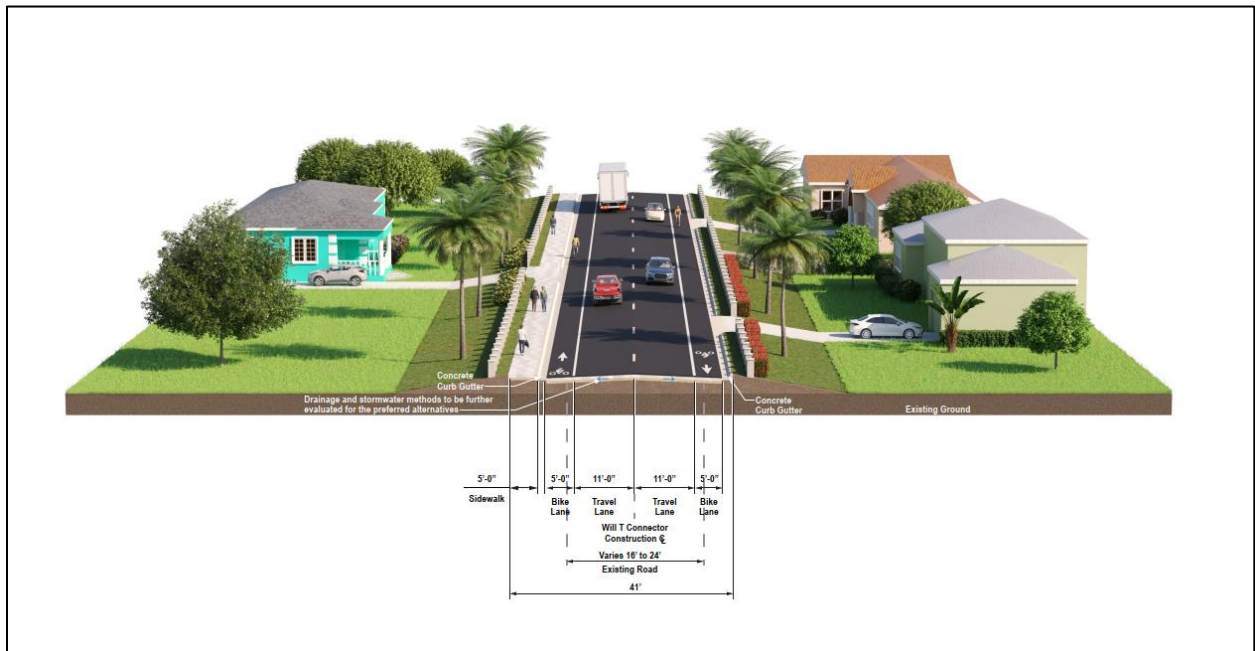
2026 Will T Connector Typical Section for Alternatives B1, B2, and B3
